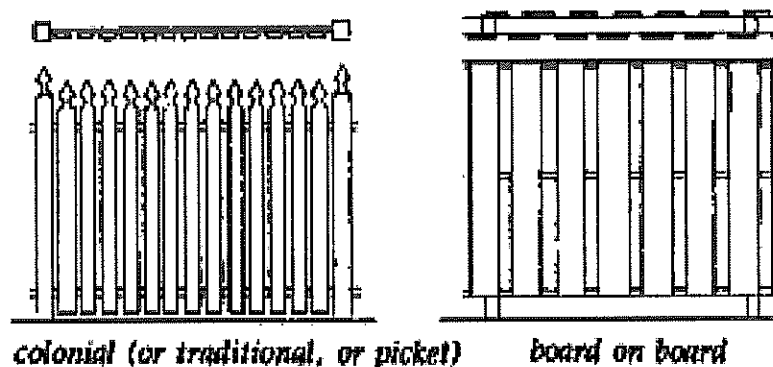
Typical fence styles found in some backyards of Original Northwood
